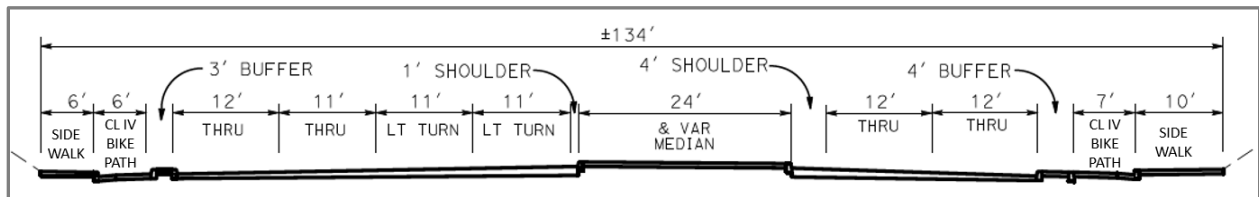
Alternative 5C – Middlefield Road Cross-Section
